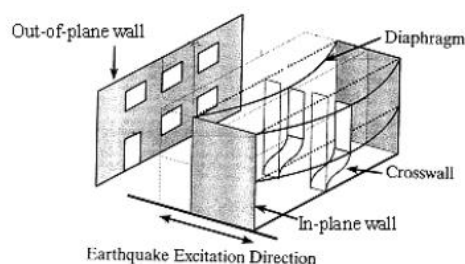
Behavior of unreinforced masonry walls under earthquake excitation (Yi,2004)
